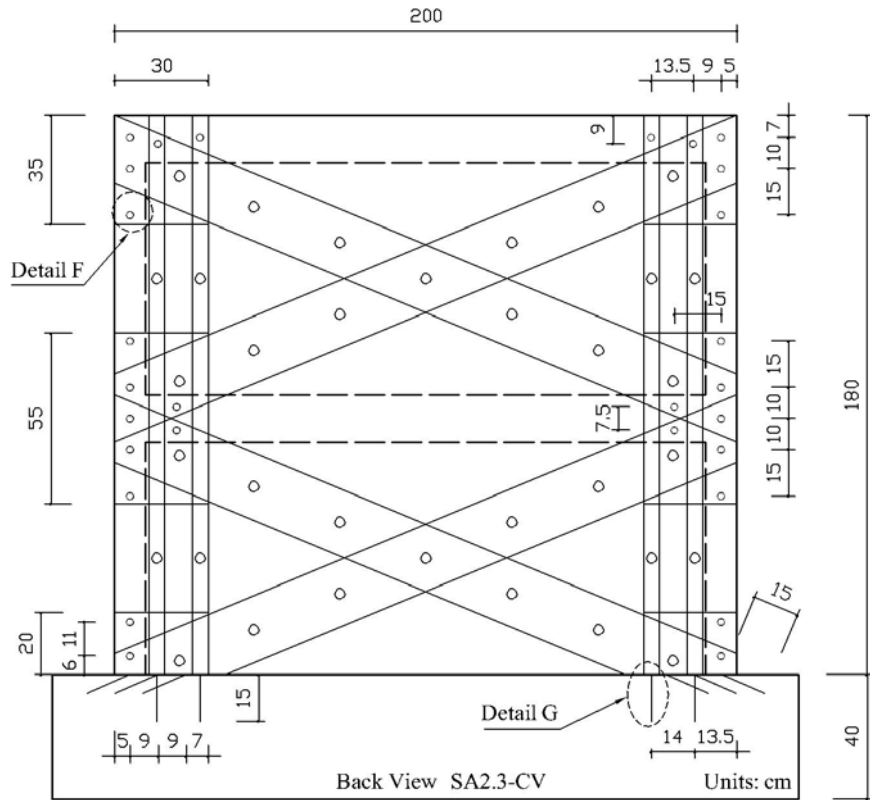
Back view of strengthening details of specimen SA2.3-CV
